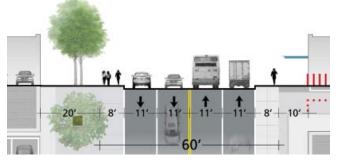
Typical section showing State Avenue existing right-of-way within downtown, Kansas City, KS
